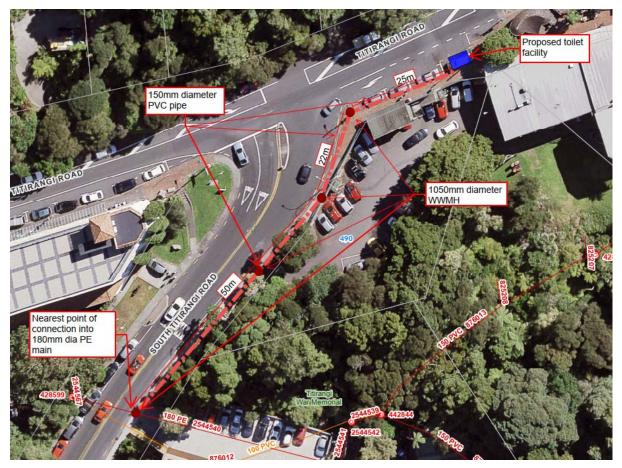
Wastewater connection to Toilet Facility (AC GeoMaps 2019)
